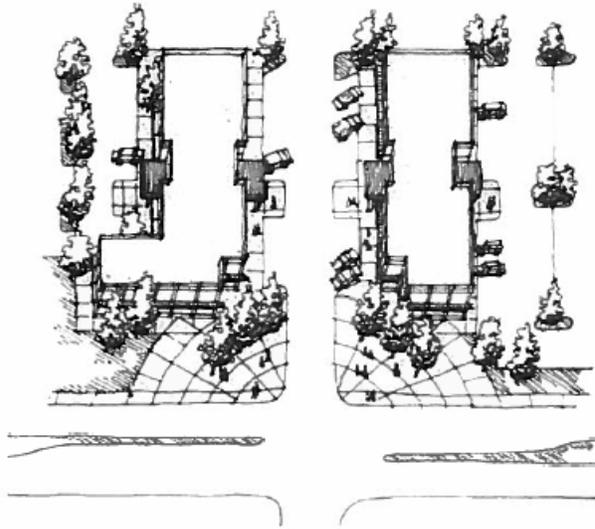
Pad sites shall be clustered together to define street edges and entry points or to enclose and create interesting places between buildings.
